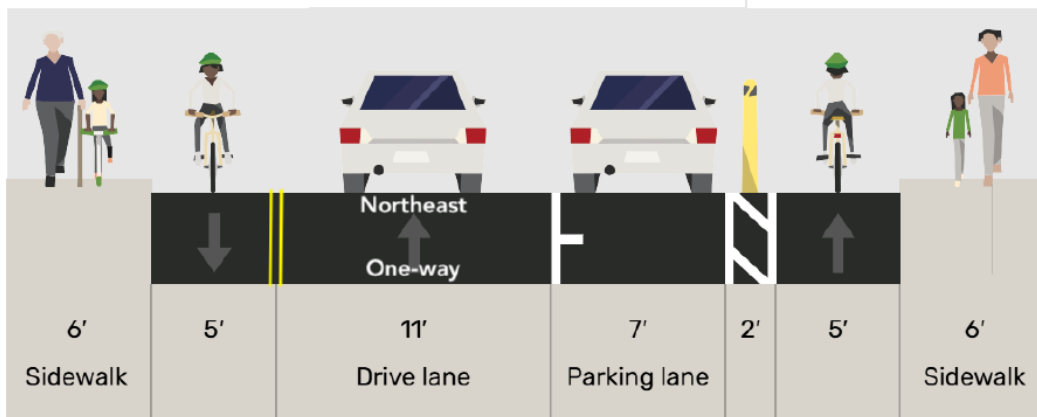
Proposed one-way conversion and new signal on 800-900 blocks of West Virginia Ave NE
